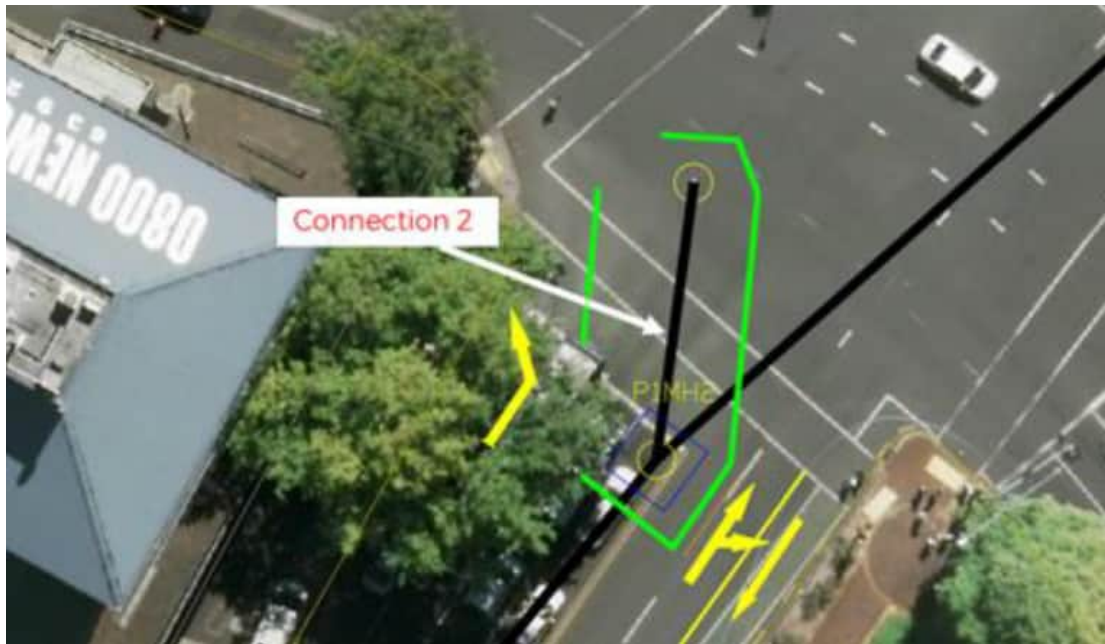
Plan view of short-term TM for an EOP connection using opencut method
